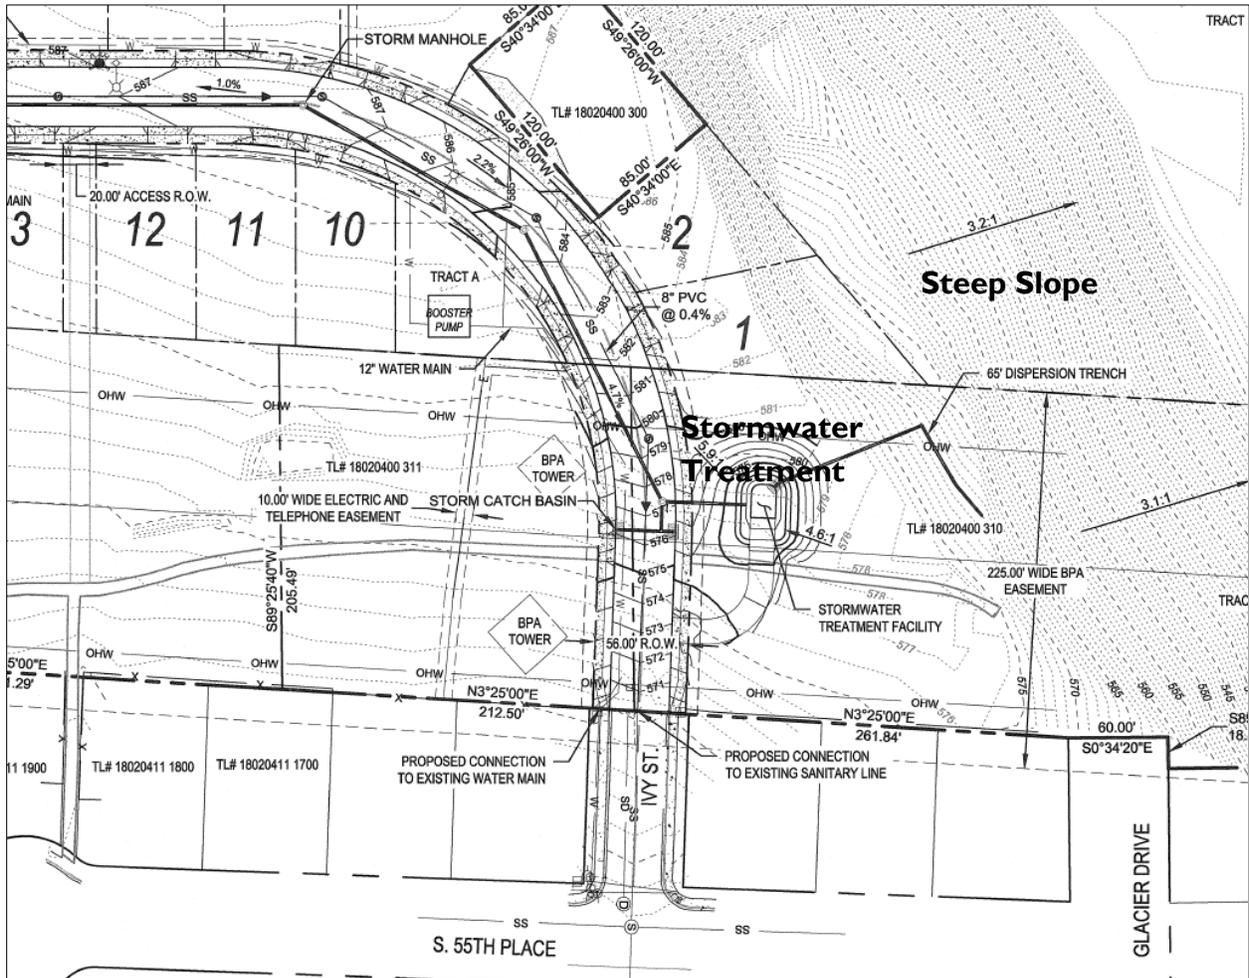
Excerpt from the Laurelwood Subdivision Plan showing the proximity of the Ivy Street extension and the stormwater treatment facility to the north-facing slope.
